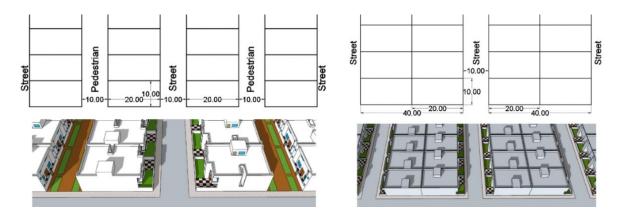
Typical urban planning blocks layout in Duhok city.
